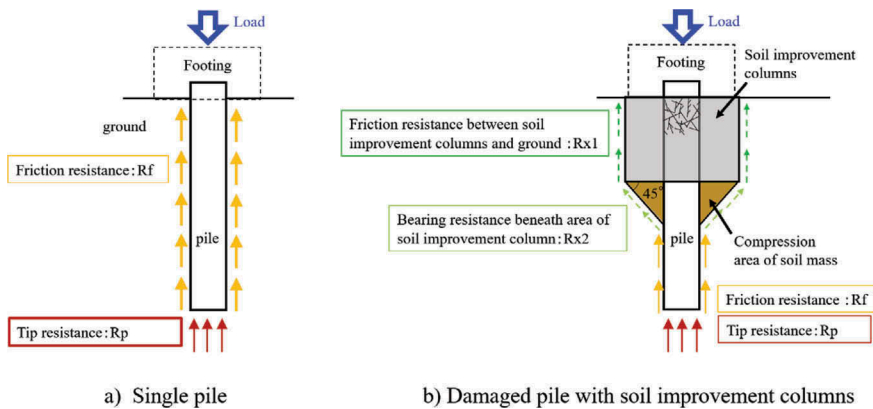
Bearing mechanisms of single pile and damaged pile reinforced by soil improvement columns
